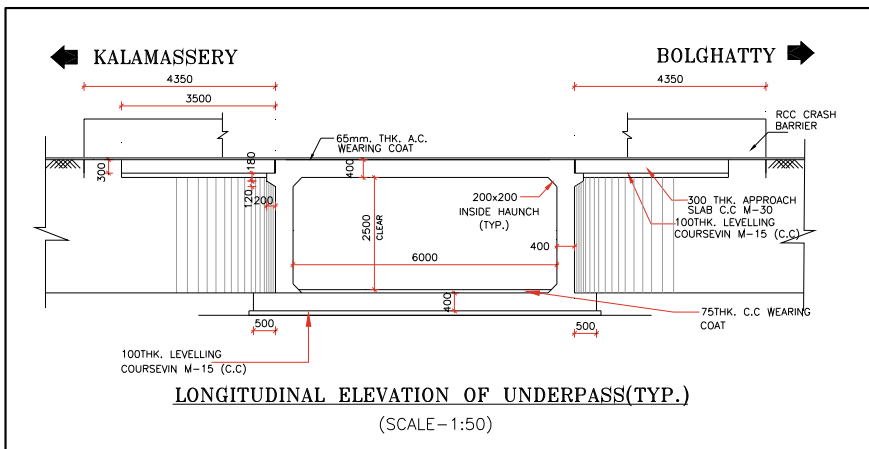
Typical details of longitudinal section of RCC box type underpass
